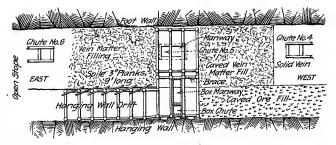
PLAN OF CAVED STOPE SHOWING SPILED DRIFT AND CENTRAL TRENCH
